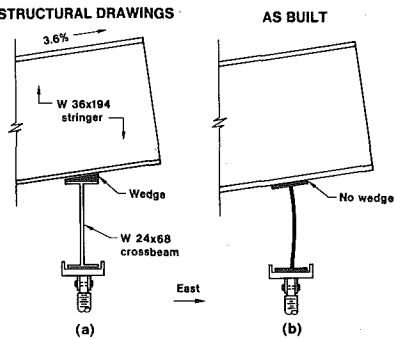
Comparison of Specified and As-Built Construction Detail Between Stringers and Crossbeams (Schematic, Not to Scale)
